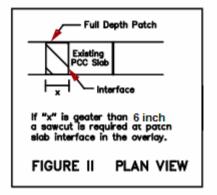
DETAILS FOR TRANSVERSE JOINTS IN ASPHALT CONCRETE OVERLAYS
